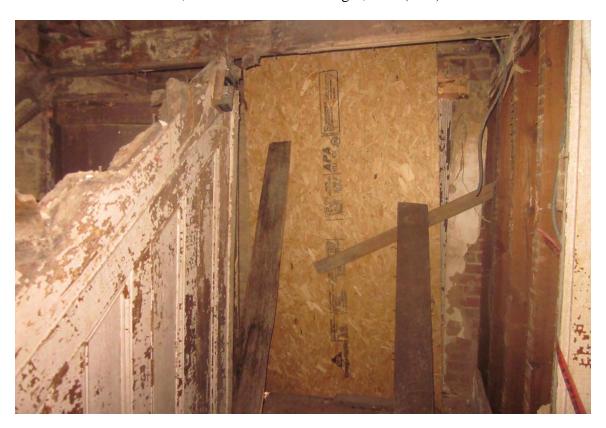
Rear Door location on 1<sup>st</sup> Floor, Room 4 at immediate right; Plan (Hall)
